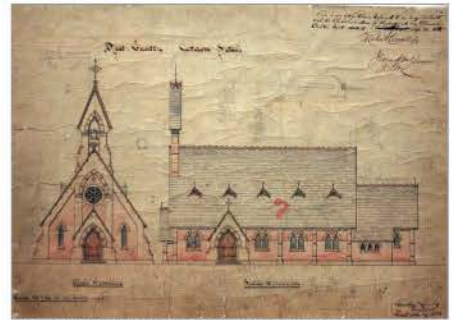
ST. PETER'S ANGLICAN CHURCH, TORONTO, ARCHITECTURAL DRAWING – FAÇADE AND SOUTH ELEVATION, GUNDRY AND LANGLEY, ARCHITECTS. | COURTESY OF TORONTO PUBLIC LIBRARY, BALDWIN ROOM.
